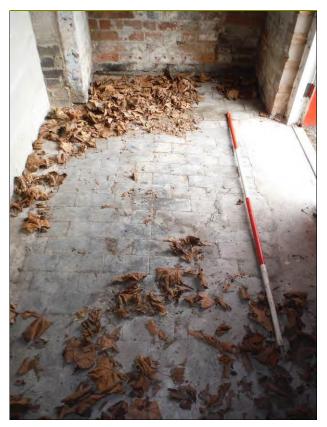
Detail of the brick floor in Room G10 (Scale = 2m).
